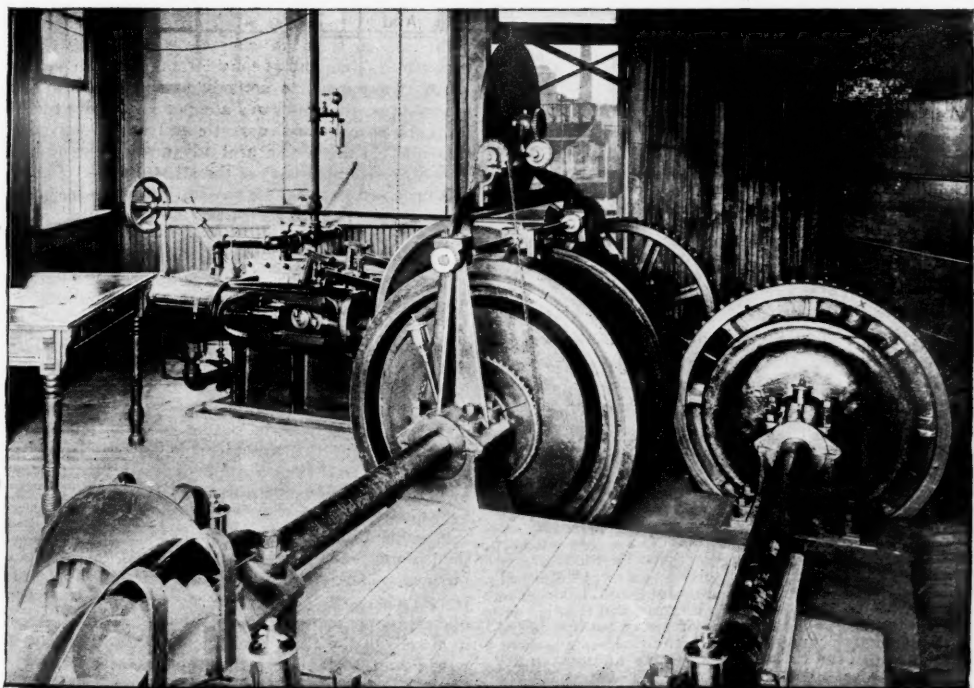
Interior View of Engine-House—C., L. S. & E. Swing Bridge.
